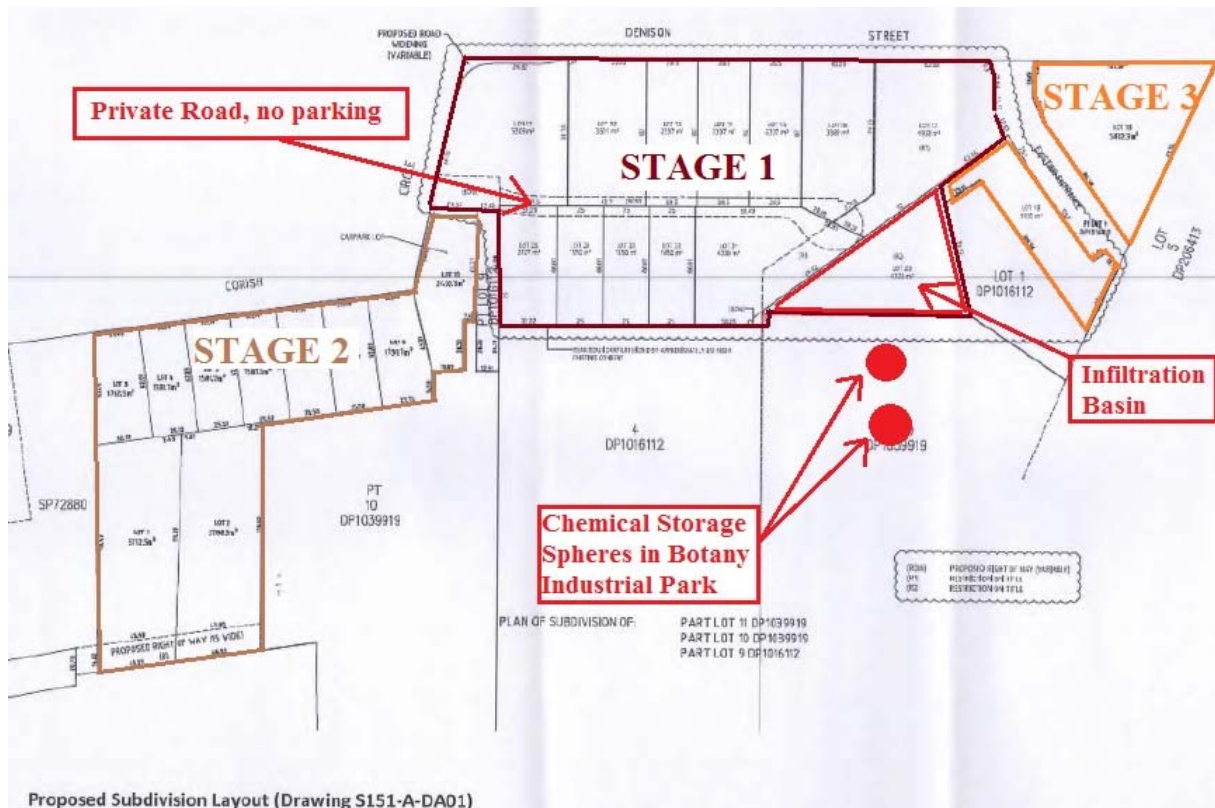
Marked up proposed modified subdivision layout as originally filed with the Court – including a private road with no street parking.
